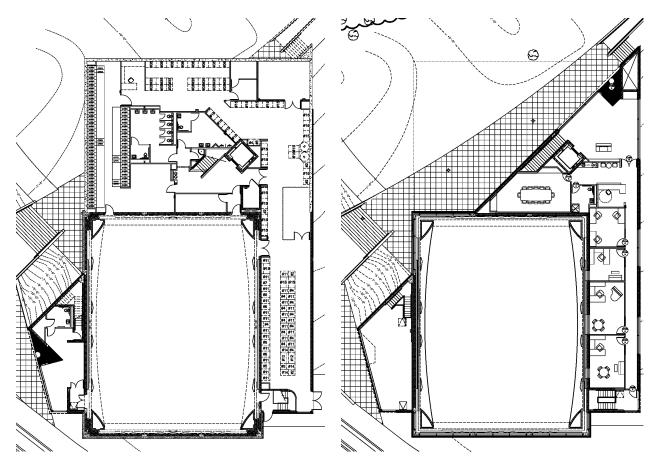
Building B ground and second floor plans (University of Florida, Division of Facilities, Planning & Construction 2011)
